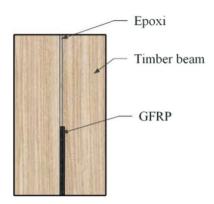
Schematic diagram of FRP sheet reinforced beam section [64]
